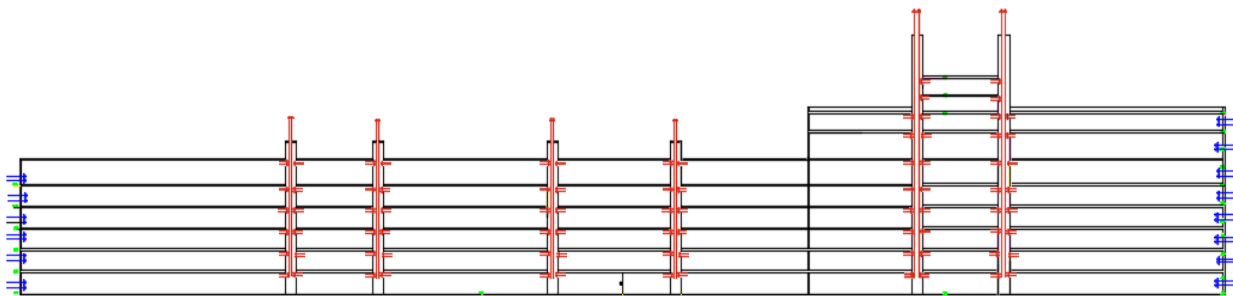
The cross-section of the architecture floor air outlet chimneys was drawn in Autocad software (Tohidi, 2020).
